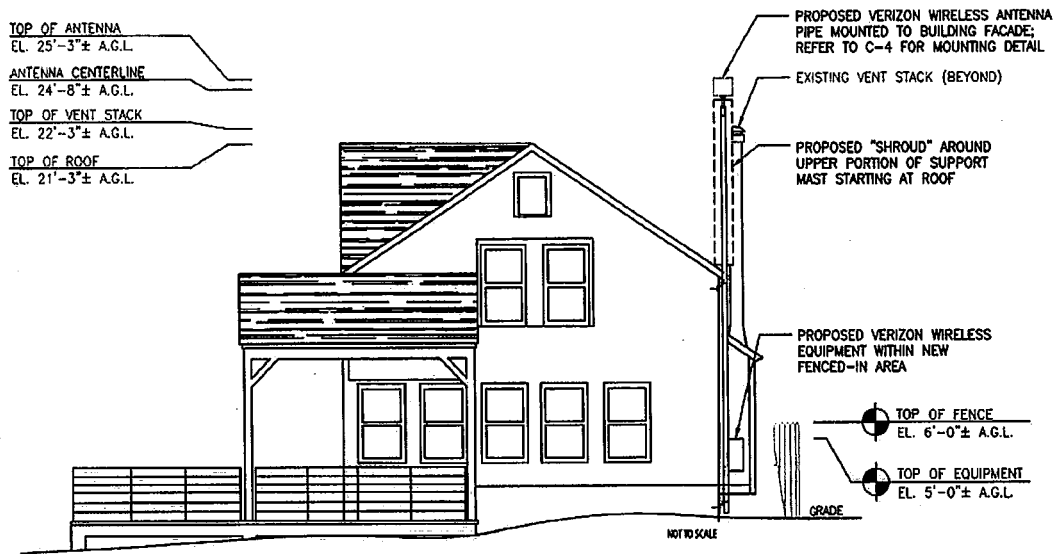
PROPOSED EQUIPMENT LOCATION AND ELEVATION PLAN FOR ANTENNA SC-1 CT
